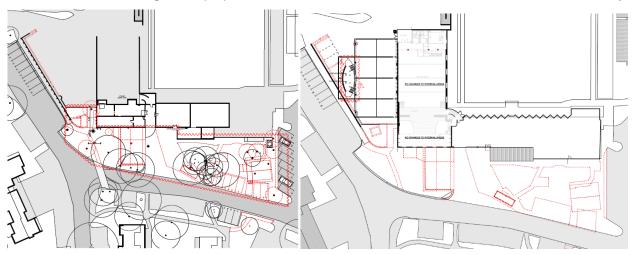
Demolition Plan, lower ground (left) and upper ground (right) Source: McNally Architects
